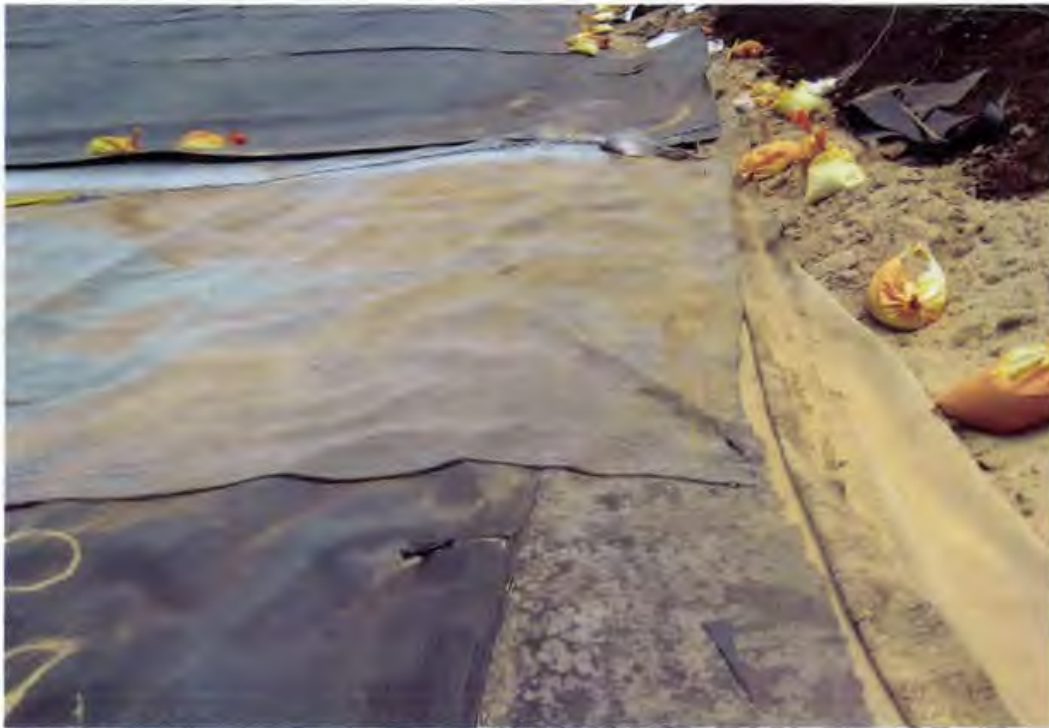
New GCL panels overlap a minimum 1 ft beyond the subbase tie-in to the existing Phase II containment system (looking north)
